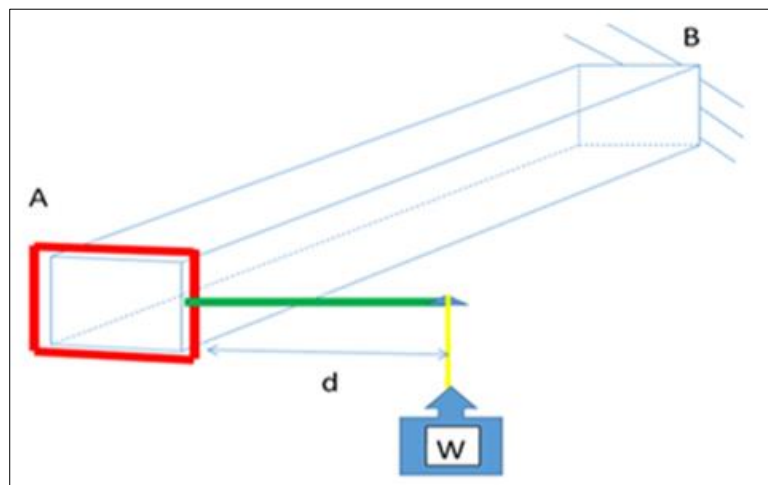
Concrete Cantilever Reinforced Beam Subject to Torsional, Shear, and Moment
